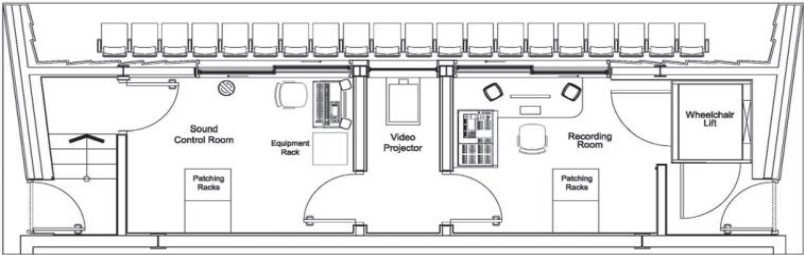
Concert Hall Control suite: Guildhall School, Barbican, London, UK [6]
